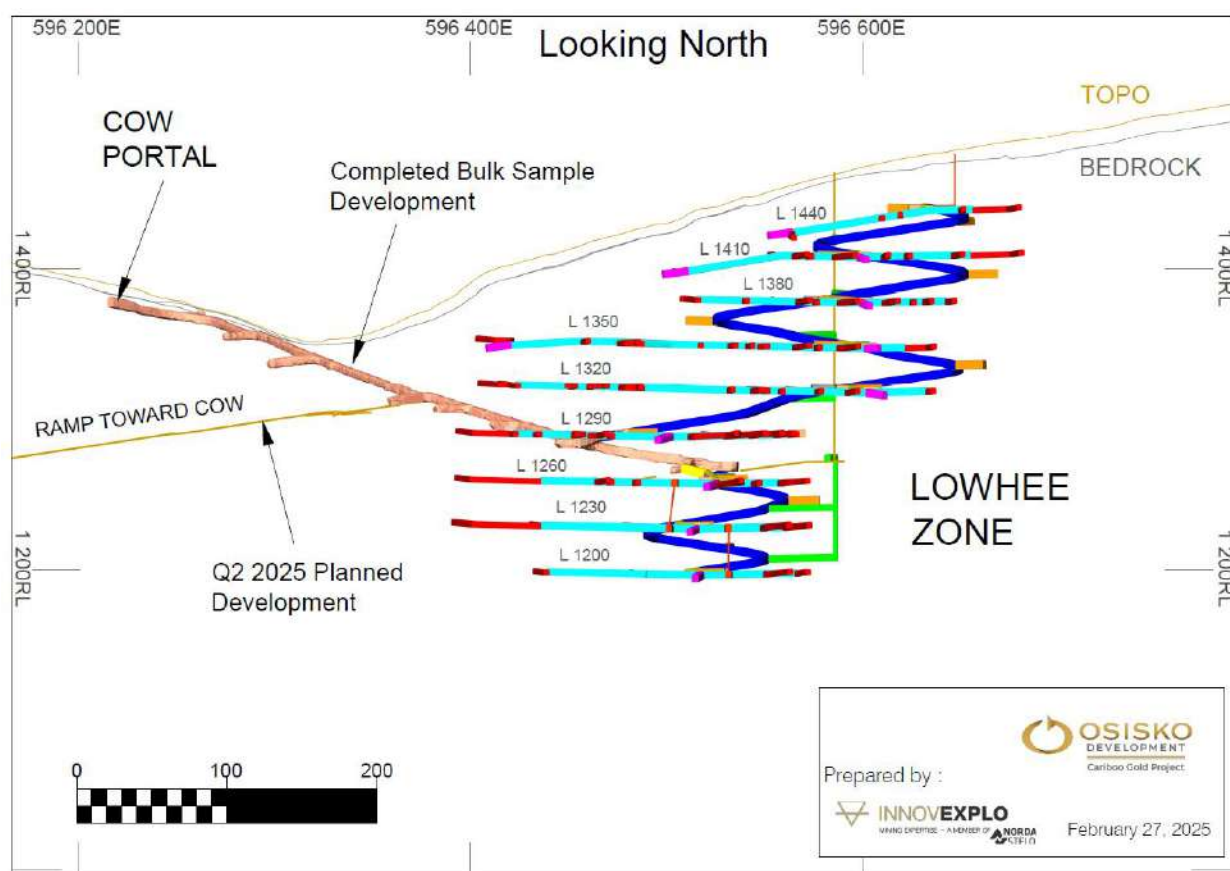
Longitudinal section of Lowhee Zone looking north
